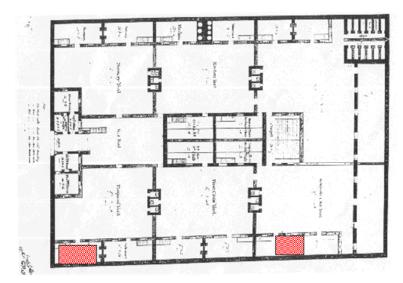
Archer's 1820s design/plan for Yard 1 showing elaborate building floor plan, the footings of which are highly likely to remain in an excellent state of preservation. Test excavations by Kostoglou (2001) are highlighted in red.
